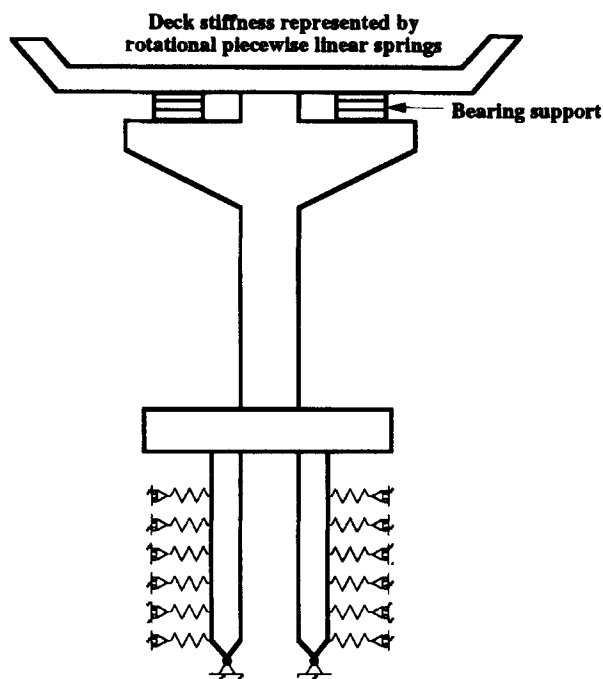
Modelling assumption MS (6) (pier incorporating foundation structure, soil stiffness and deck restraint)
